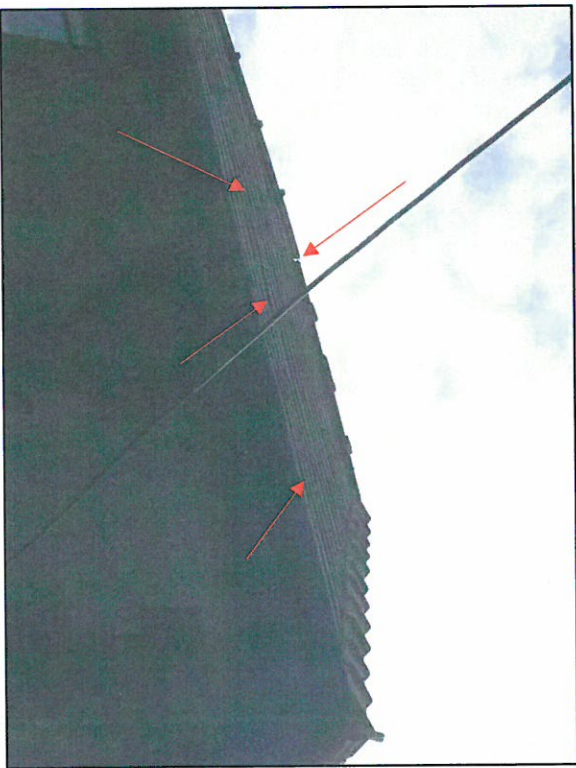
Dislodged ridge tile and gaps in slates (north elevation roof).
